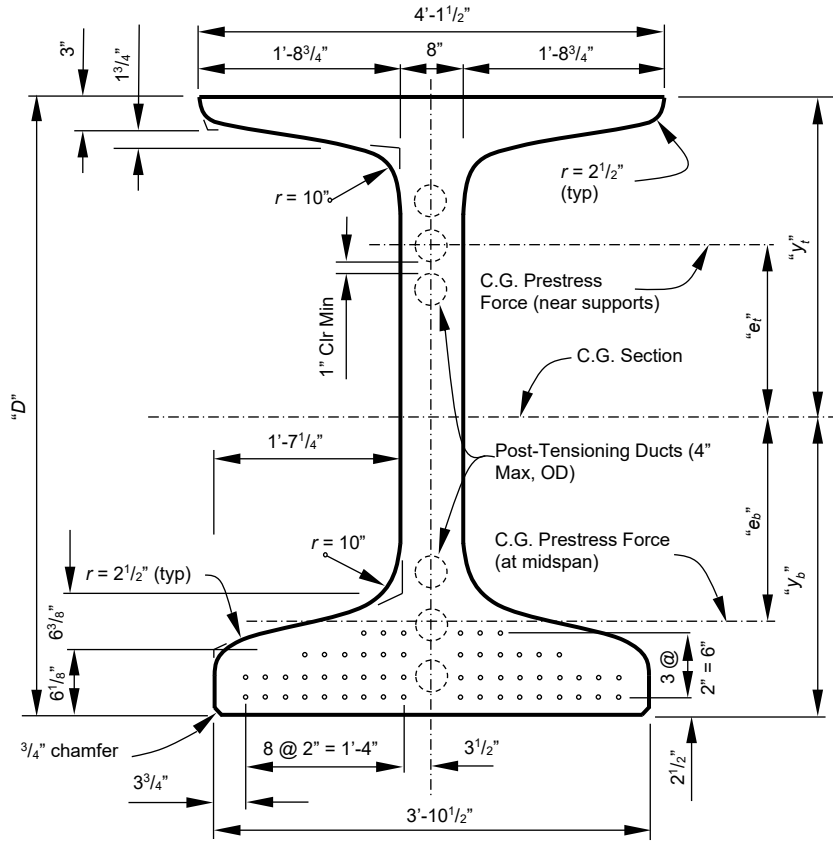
California Standard Post-Tensioned "Wide-Flange" Girder Typical Section
